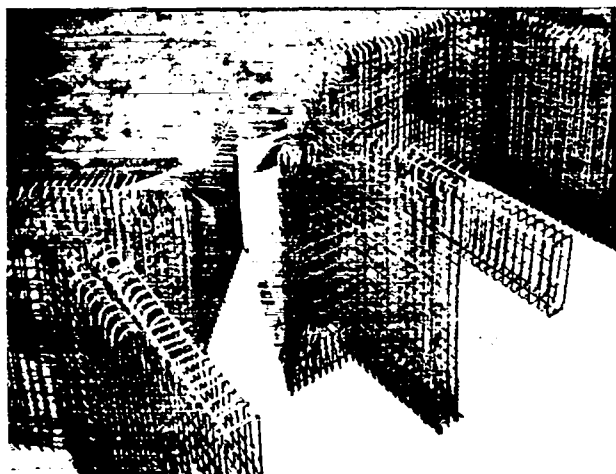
Reinforcing bar assembly showing adjacent model bays and remote control barrier.
